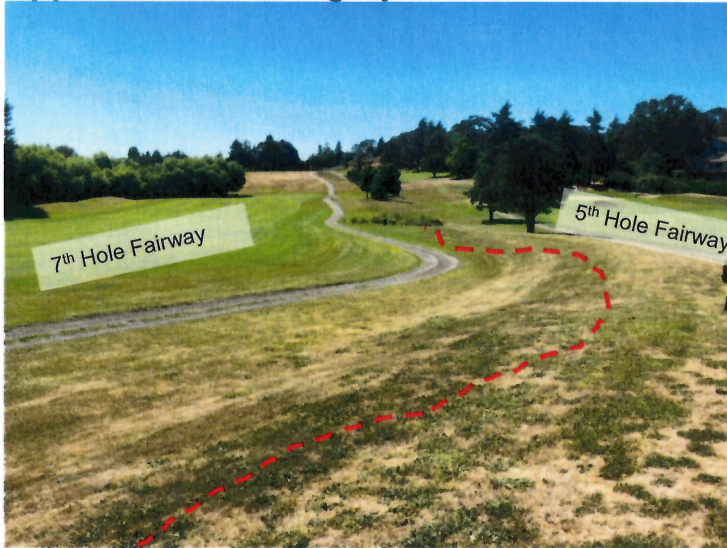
Outlet of storm drain under 7<sup>th</sup> Hole fairway
